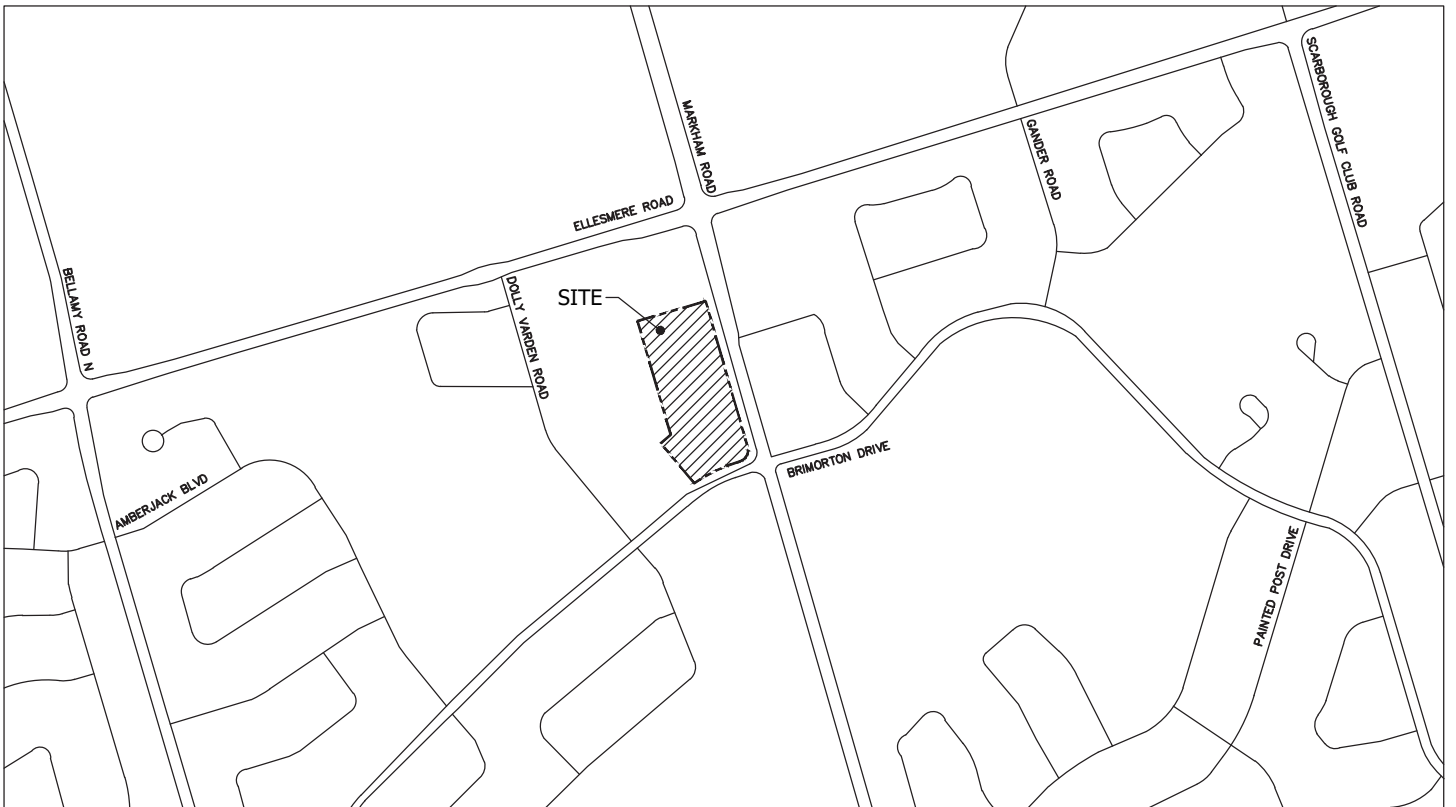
Site Location illustrates the subject site within the context of its surroundings.
